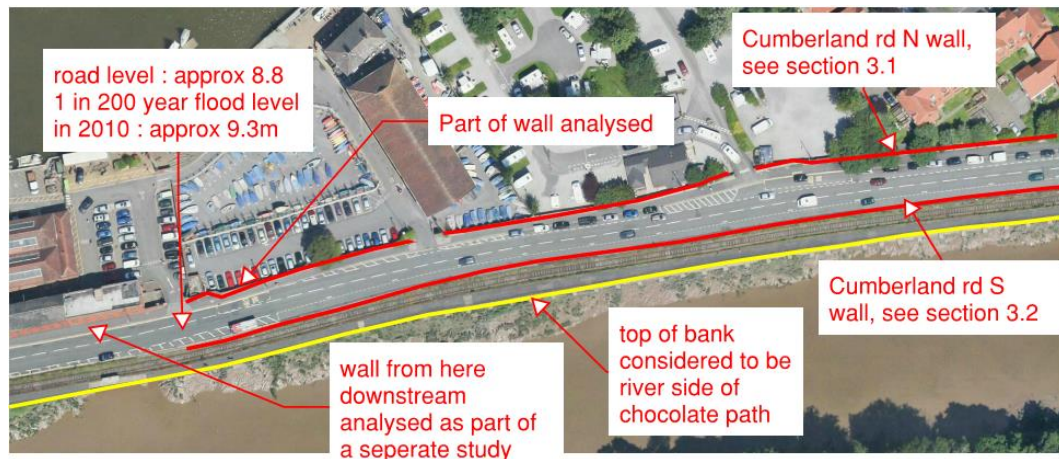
West section of Cumberland Road, aerial image © Blom 2012
